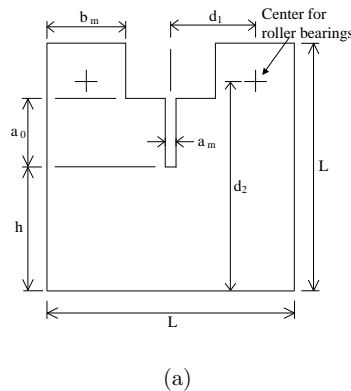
Scheme of the wedge splitting test specimen. Dimensions are summarized in Table
